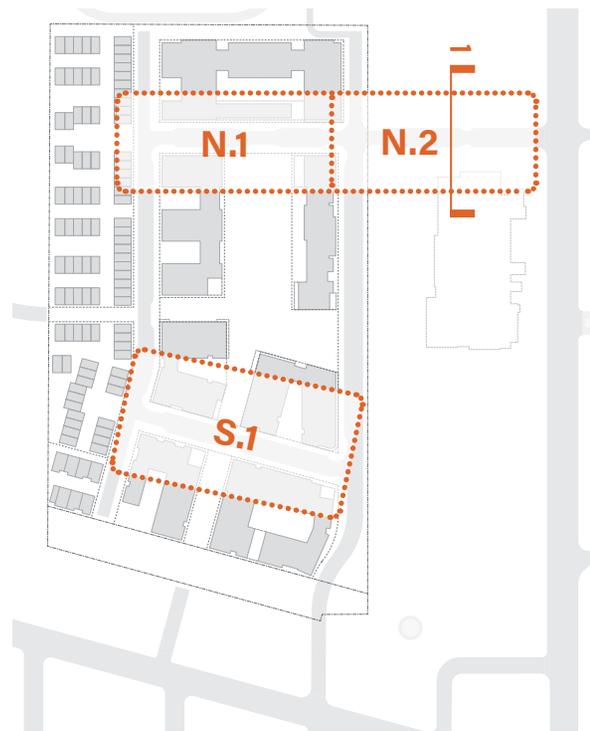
North & South Street, Plan Enlargements N.1 & S.1
